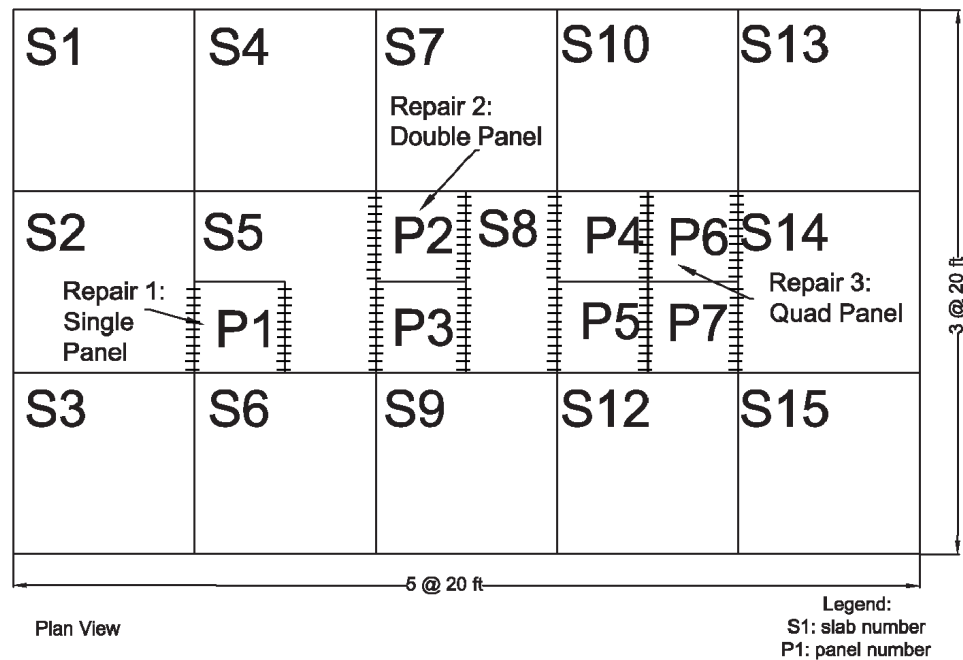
U.S. Army ERDC Full Scale Test Section Layout
